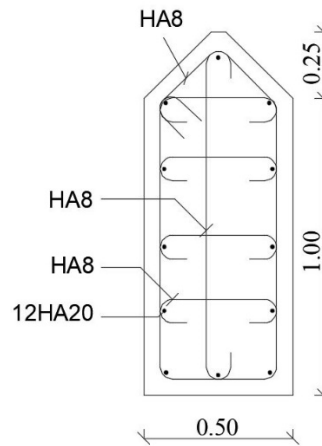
Longitudinal reinforcement of designed girder.
